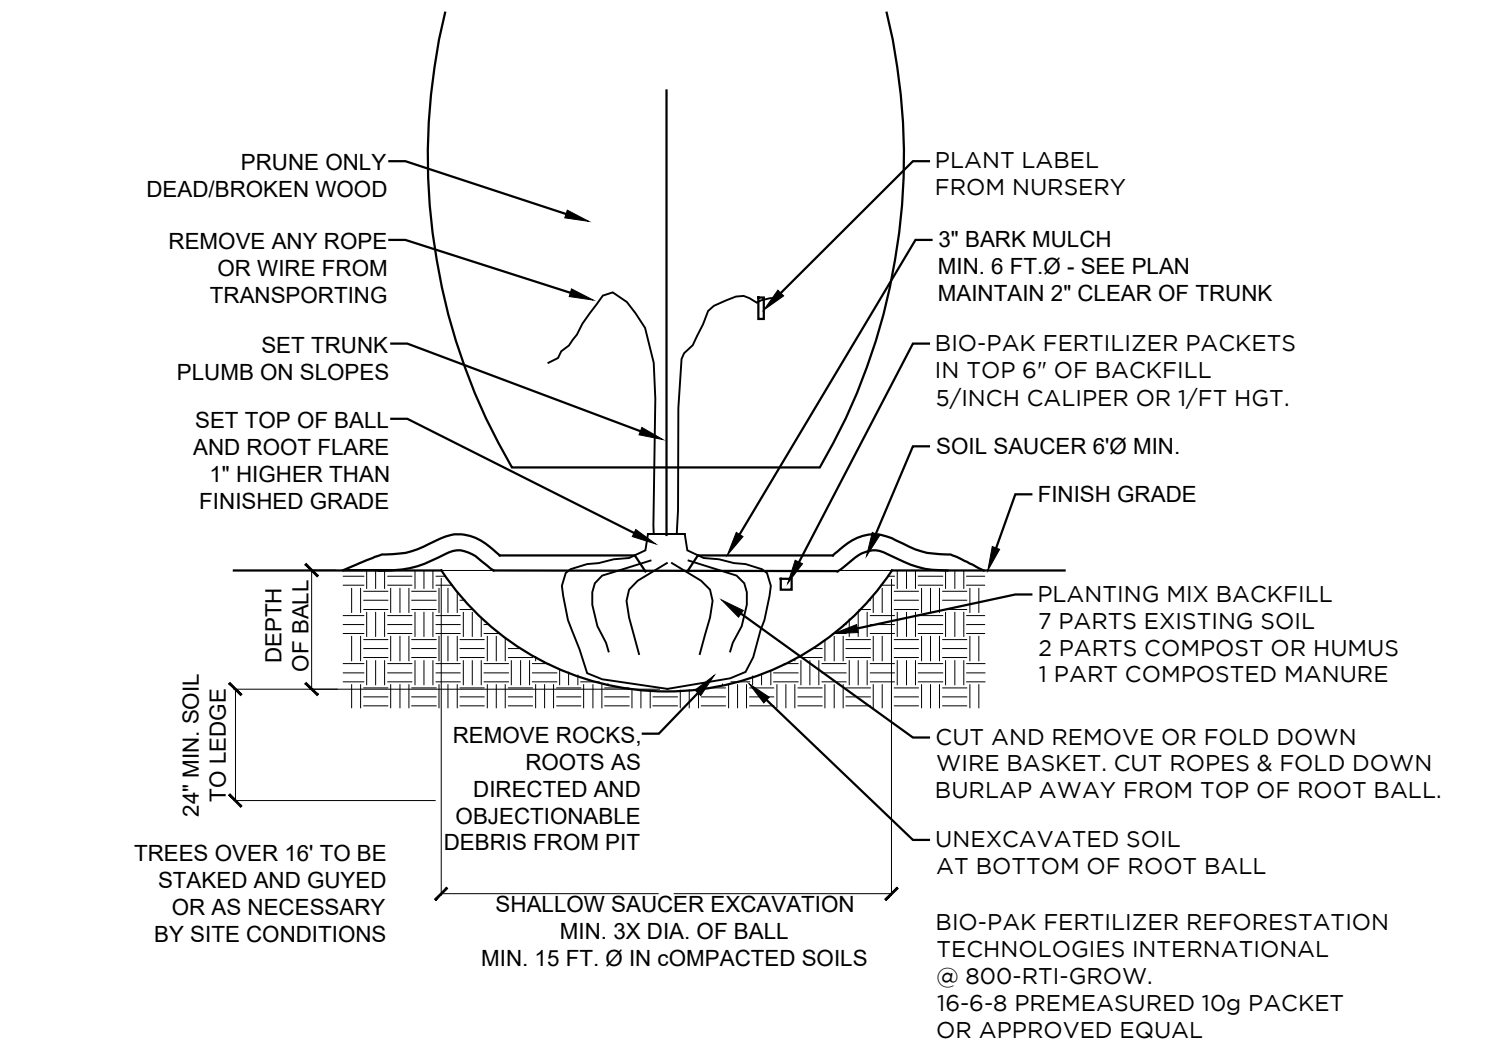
, 2-Dimensional and 3-Dimensional Design, document 002, 04, Landscape Architecture, SHEET FILES, SITE PLAN - LANDSCAPE DETAILS.dwg
